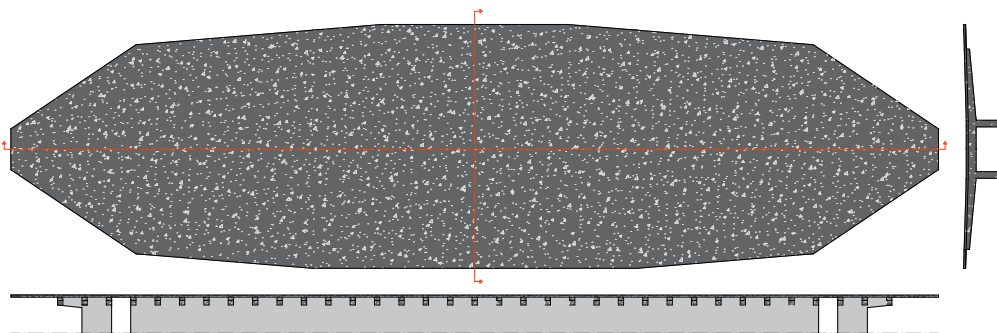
Plan view and sections of the covering. From Drawing 8.
